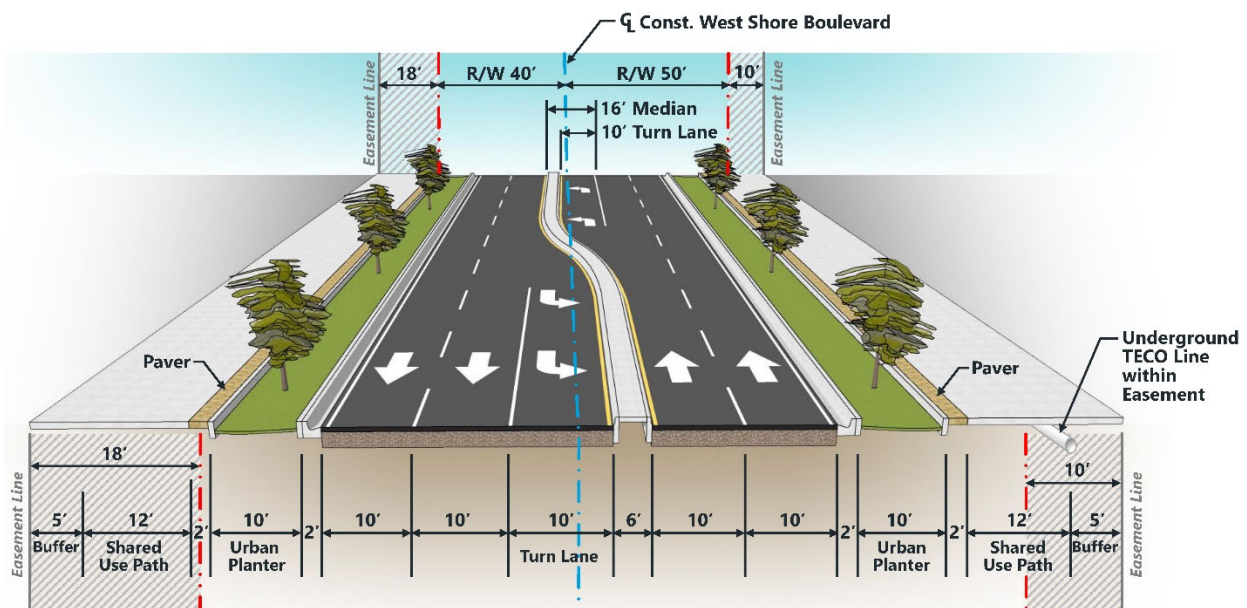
Recommended Typical Section Looking North between I-275 (SR 93) and W. Cypress Street
